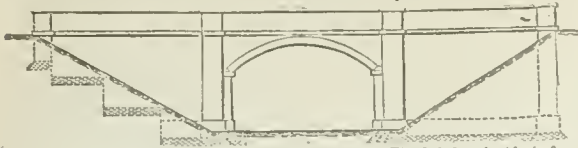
Ordinary bridge over or under a railway. The left-hand side is for a cutting, and a bridge over the railway; the right-hand side is for an embankment and a bridge under the railway; the difference is in the foundations.
